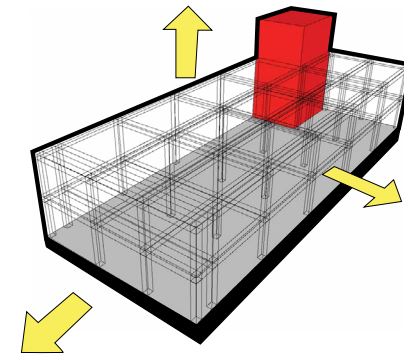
Existing Building and Circulation Core. Volume of the interior structure and overlap condition connection.
